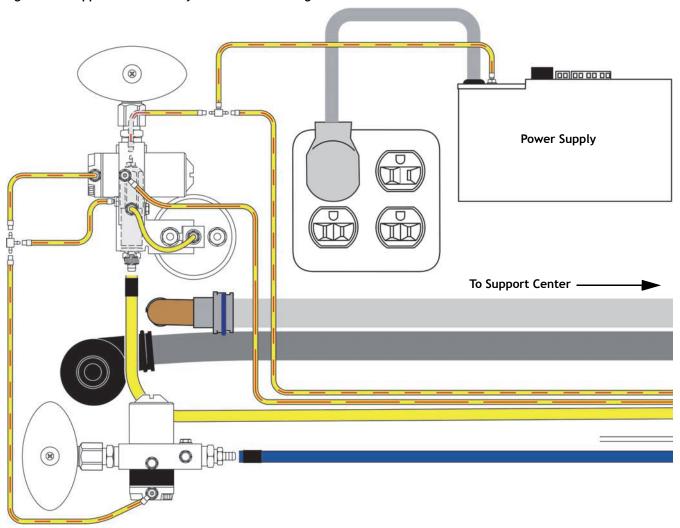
Support Center Utility Connections in a Contoured Floor Box
